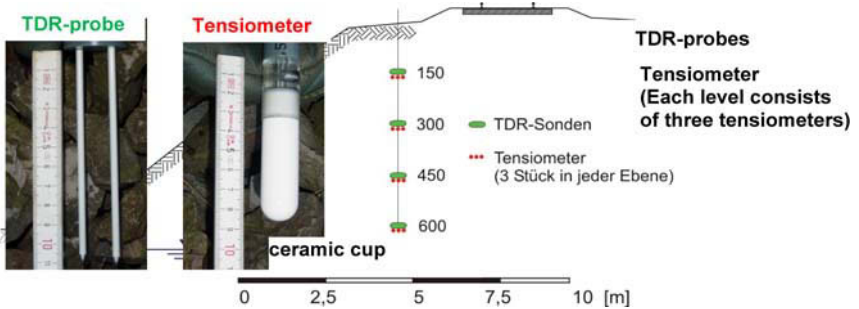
Section of the embankment with installed Tensiometers and TDR probes
